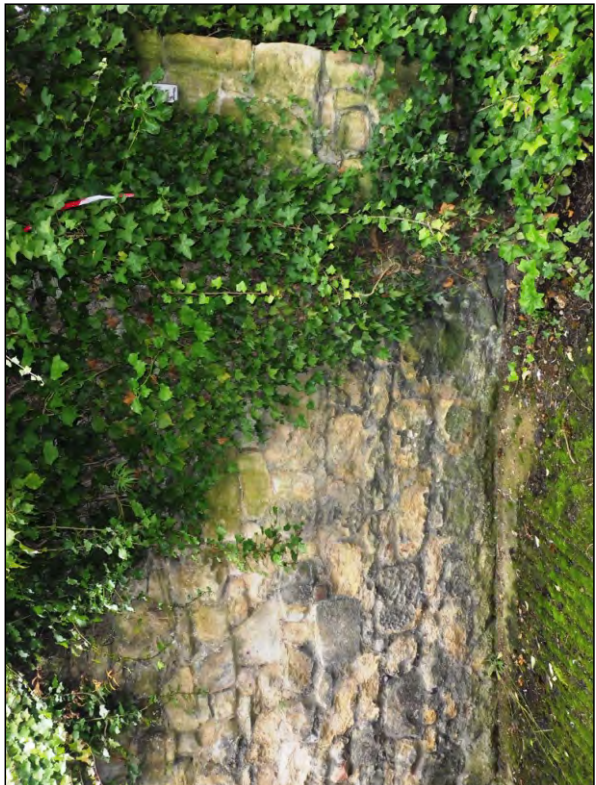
View of the westernmost surviving section of the boundary wall, looking S from the wooden stairs attached to rear wing 4.
